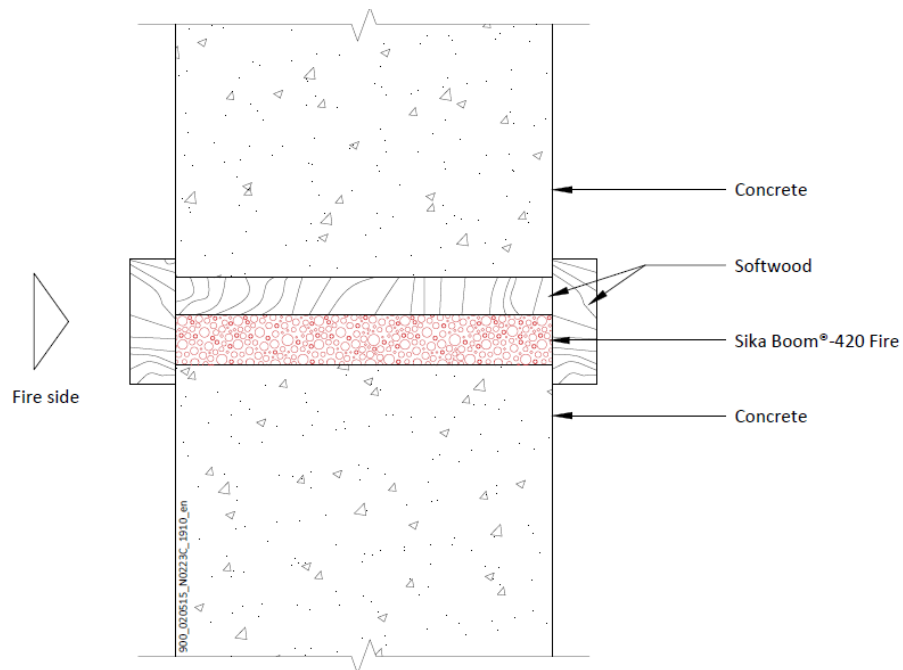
Installation on concrete wall 150mm thick with 15mm softwood insert at one side and covered on both sides with a 50x18mm softwood architrave
